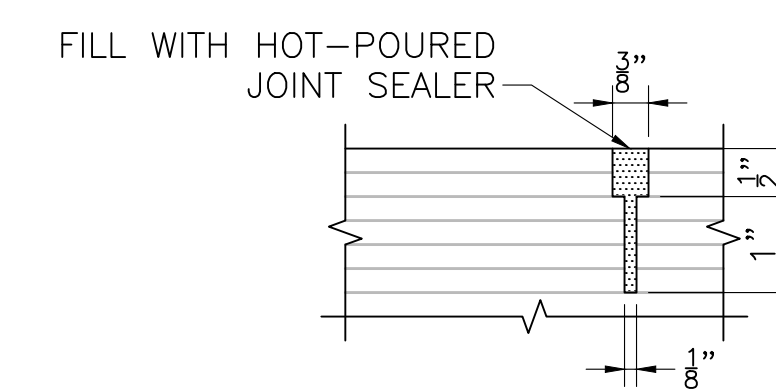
DETAILS AT ABUTMENT - SIDEWALK SECTION WITHOUT APPROACH SLAB SEAT (WITHIN PBU)
